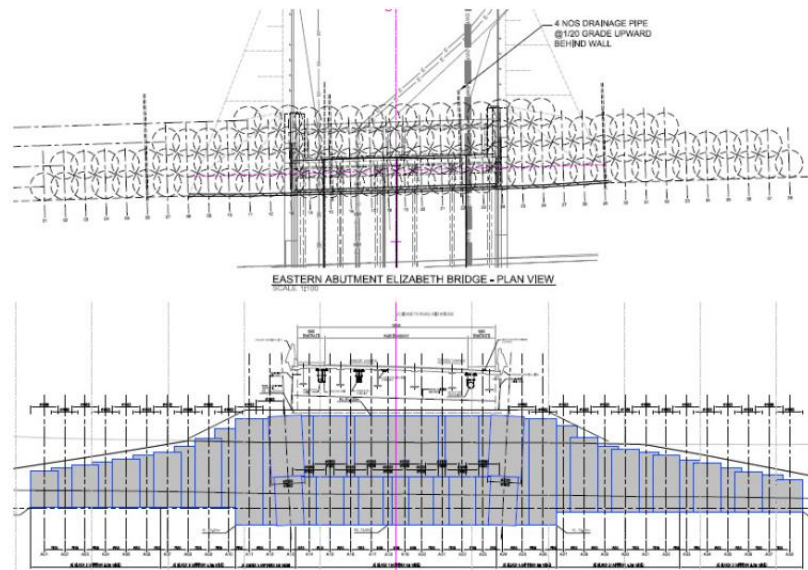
Jet grouted mass gravity wall: (a) plan view and (b) elevation (Vincent et al. 2014)
